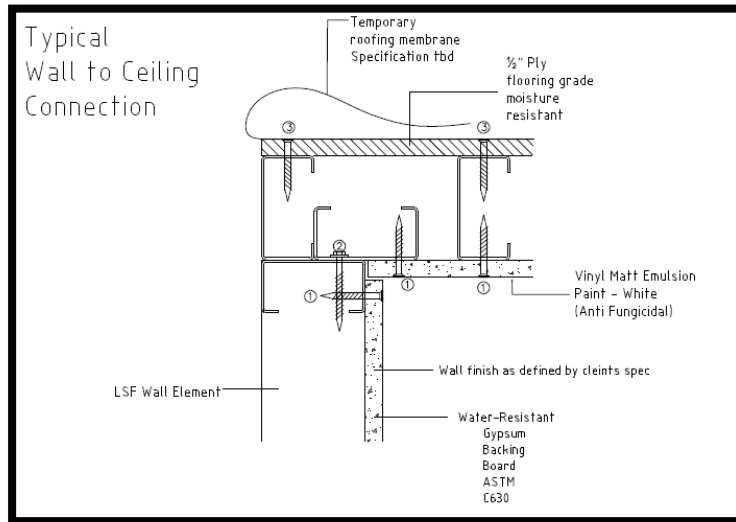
Typical Wall to Ceiling Connection (Mensch)
